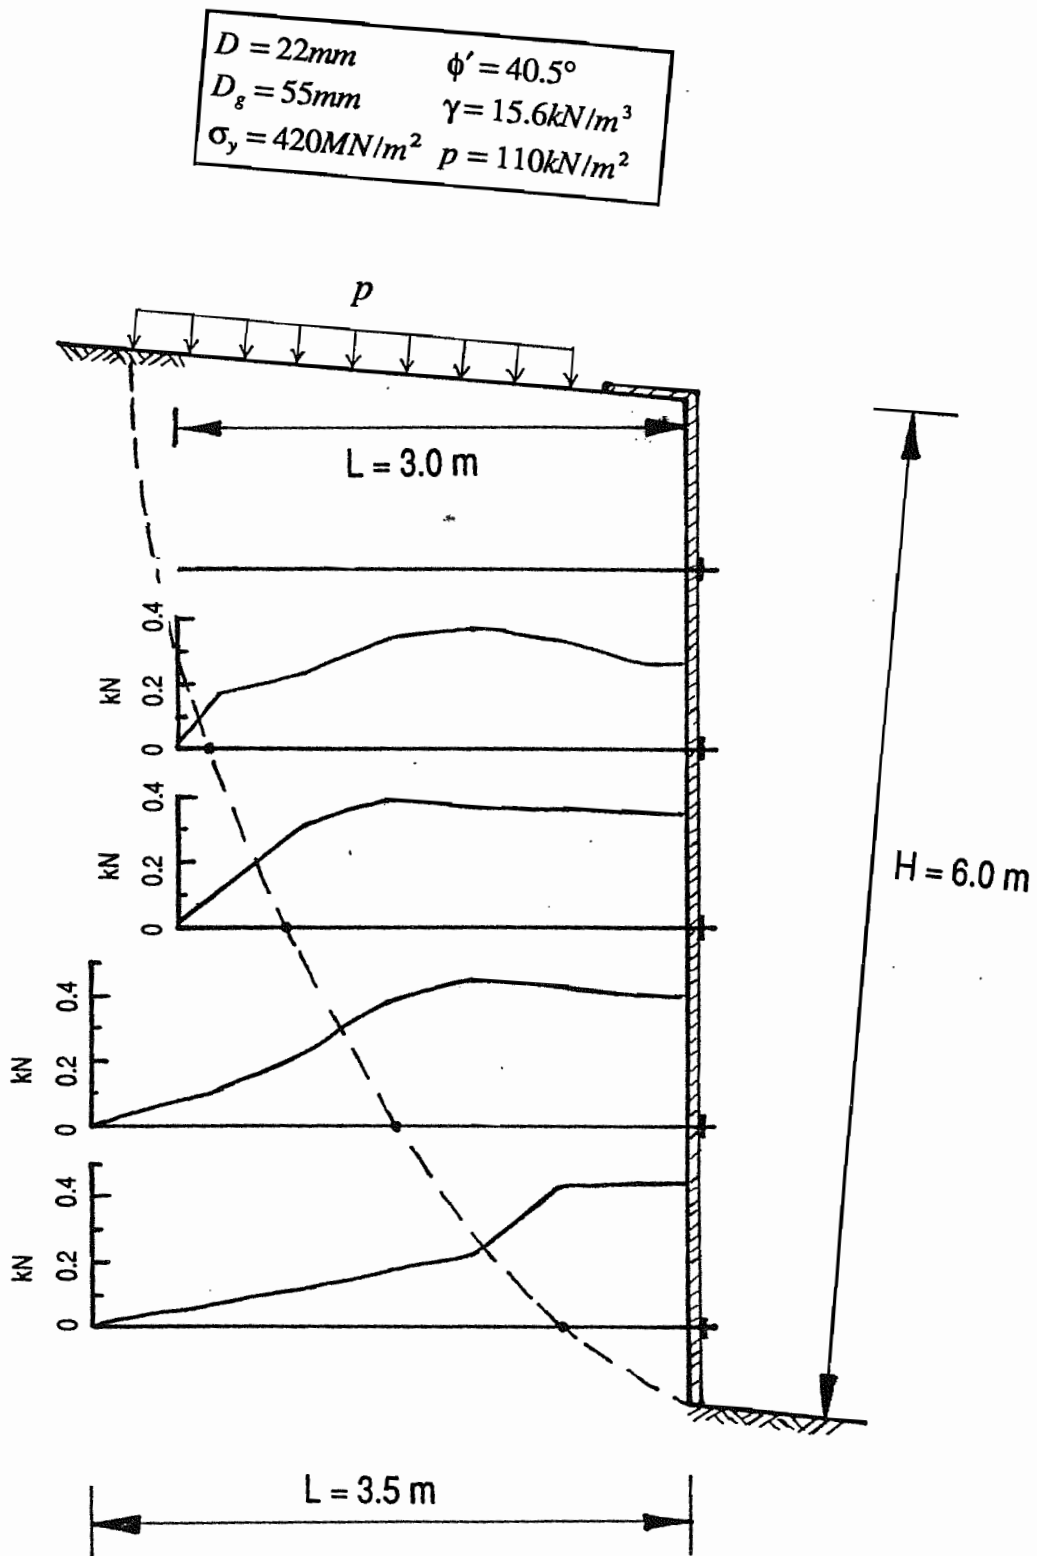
Axial force distribution at collapse of soil nailed wall, after Gassler (1987).
